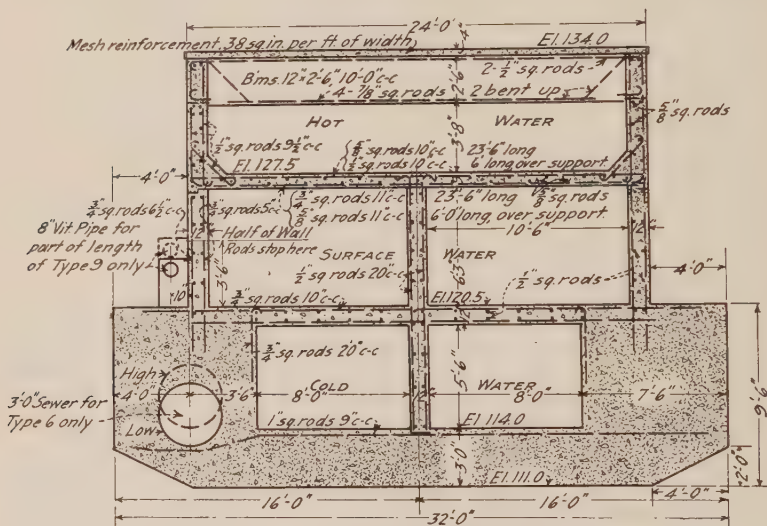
SECTION OF THREE-LEVEL CONDUIT.
